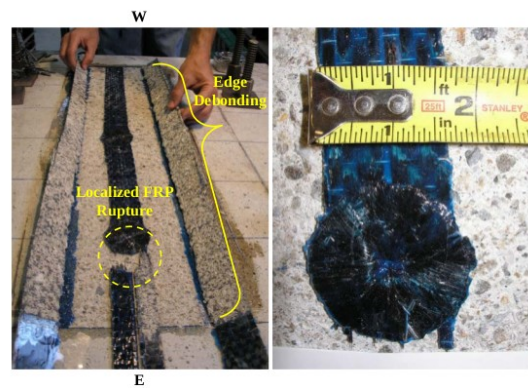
ww - Failure of the specimen with two anchors placed longitudinally [20]
